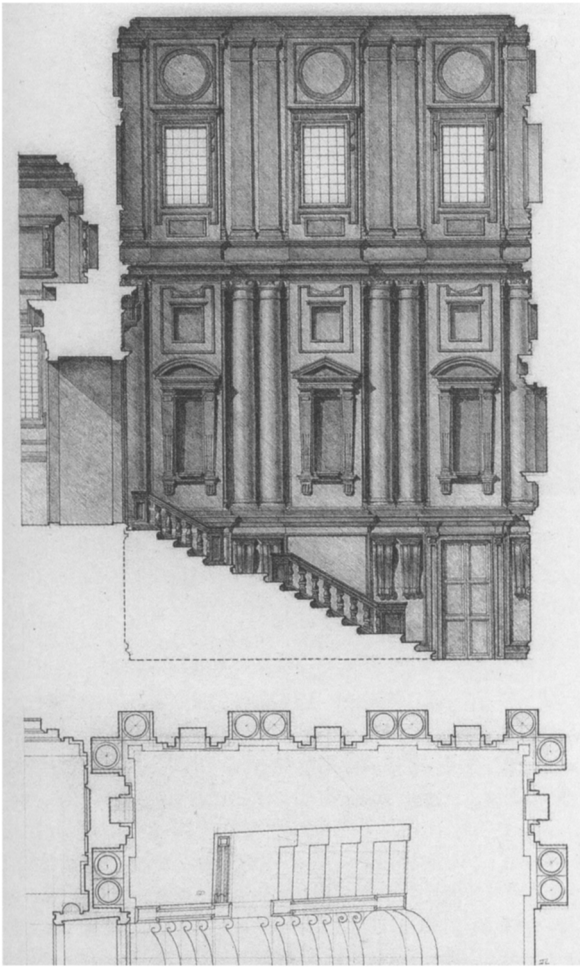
Laurentian Library *ricetto*, partial plan and north-south section (drawing: author)
